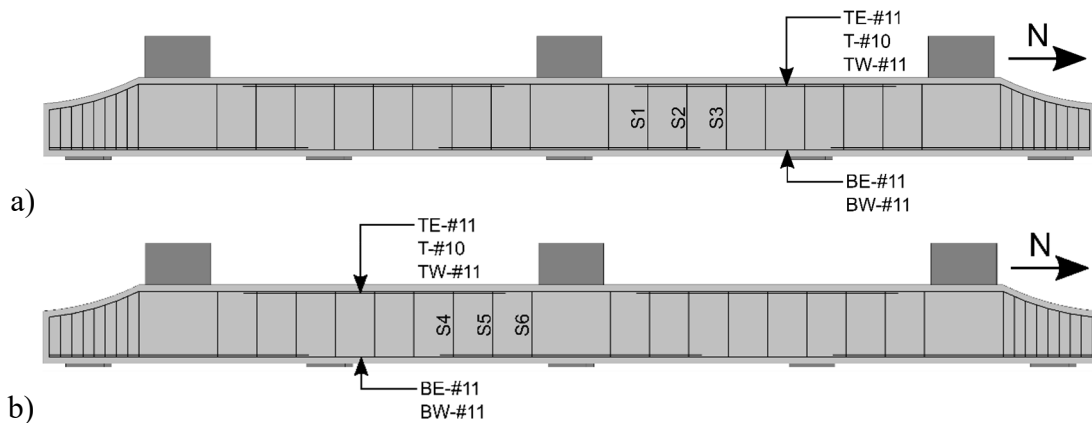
Extracted steel reinforcement location; a) Bent Cap 1, b) Bent Cap 2
